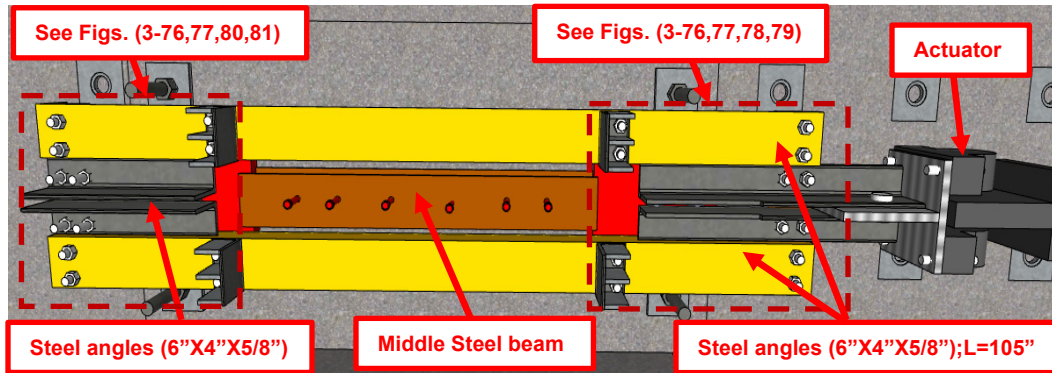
Top view of the assembly of applying the double shear forces on the connection (Hollow-core planks are not shown for clarity).
